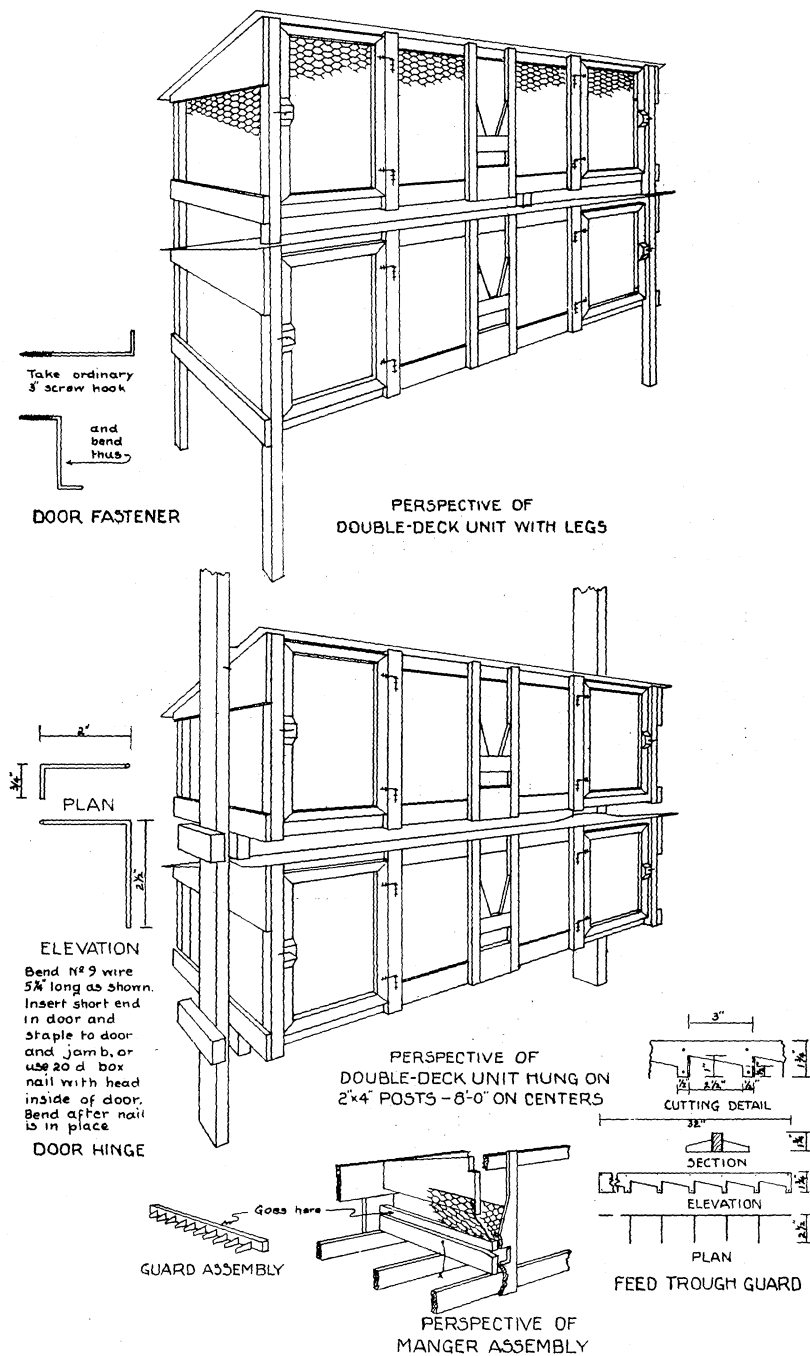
Additional construction details for a two-unit wooden-frame wire hutch, including manner of hanging two tiers of hutches.
